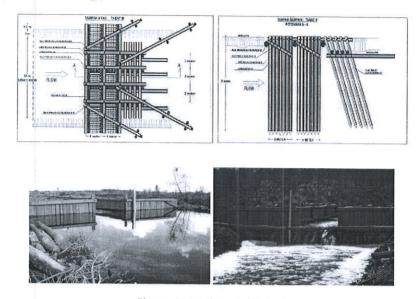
Design and Sample Souce : Guidebooks insulation trench
